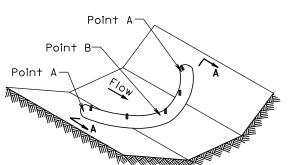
DETAIL B (TYPICAL OF ALL INSTALLATIONS)
